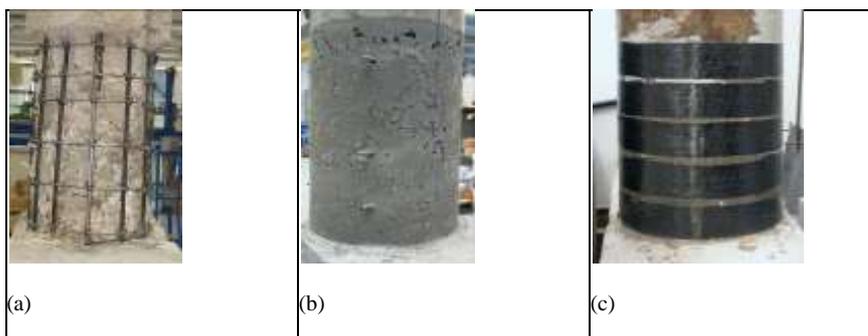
Proposed rapid repair and seismic retrofitting solution for damaged Italian pier: a) damaged rebar part substitution, b) concrete restoration and c) seismic retrofitting by C-FRP wrapping.
